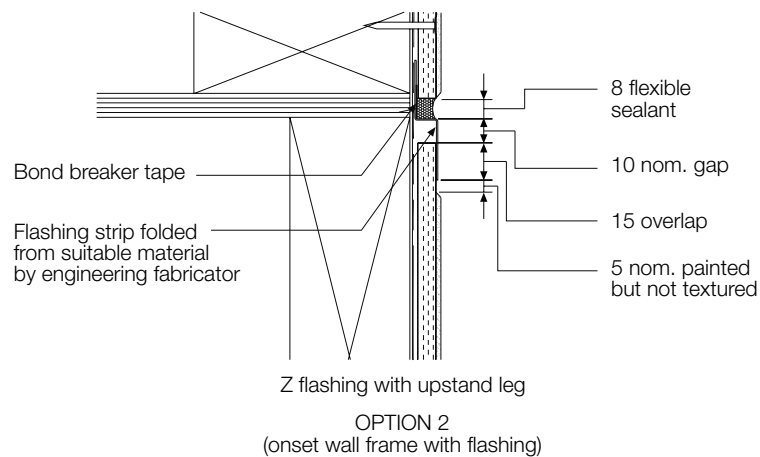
HORIZONTAL CONTROL JOINT - FLOOR JUNCTION OF A TWO STOREY HARDITEX WALL
